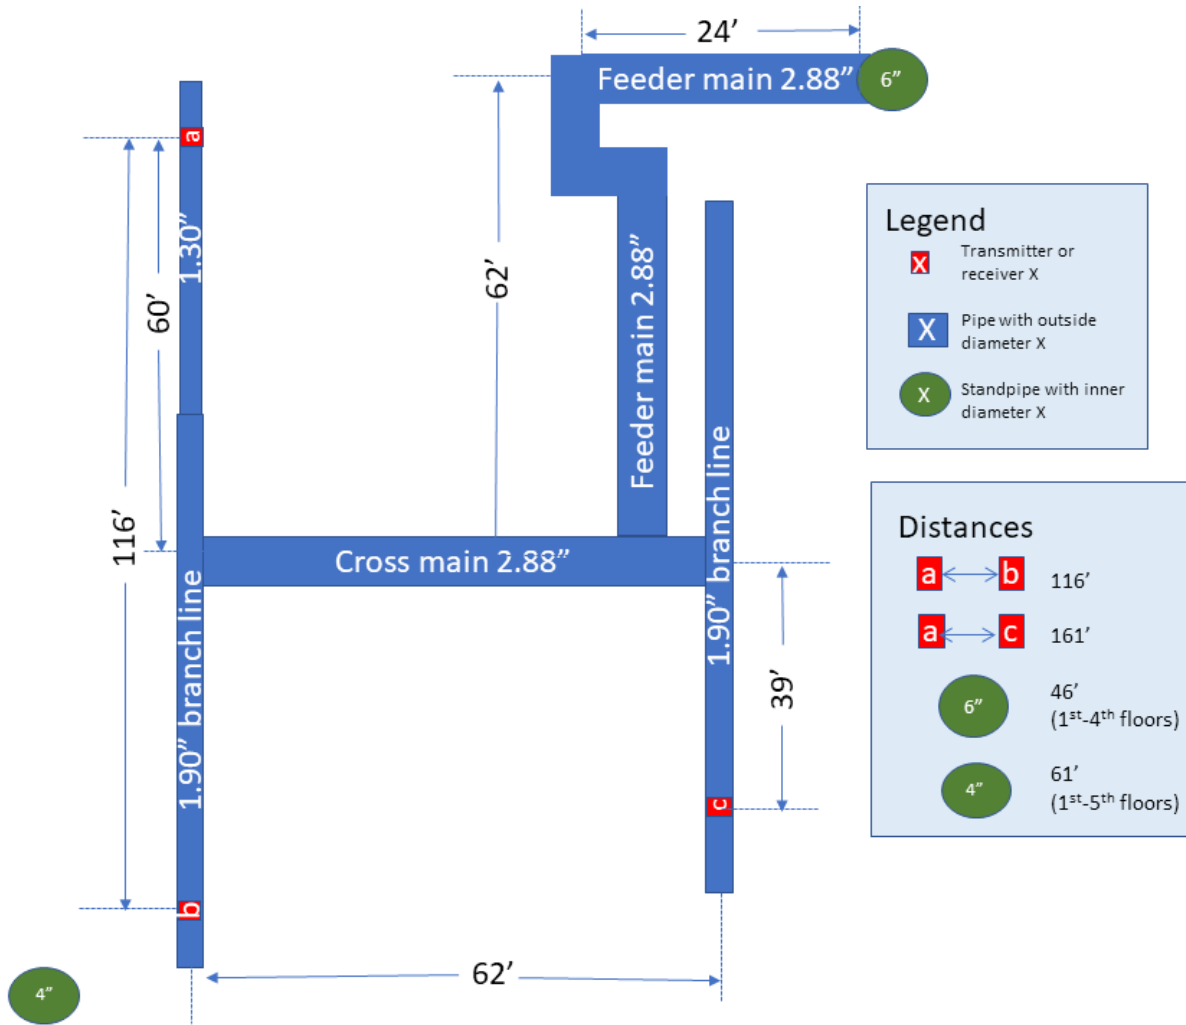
Layout and External Diameter of Fire Sprinkler Pipes Tested at New Commercial Building Locations NCS and NCR. Not shown are the dozens of branch lines that intersect the pipe pathways used in the tests, or the many small twists and turns to dodge other mechanicals.
